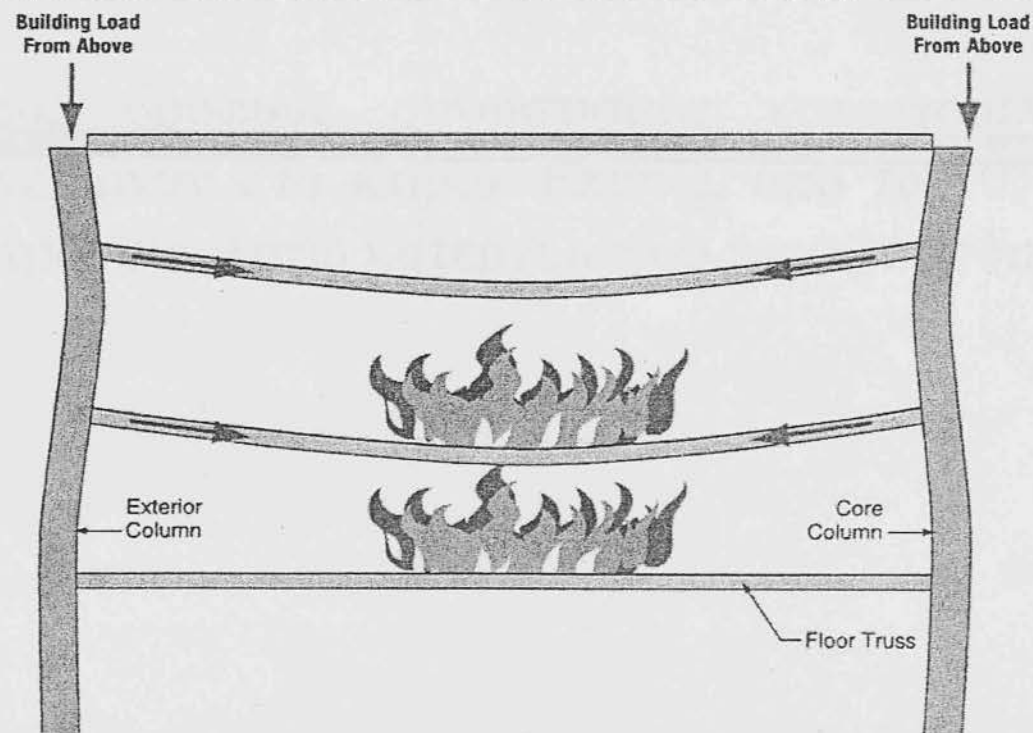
Buckling of columns initiated by failure of floor framing and connections.
